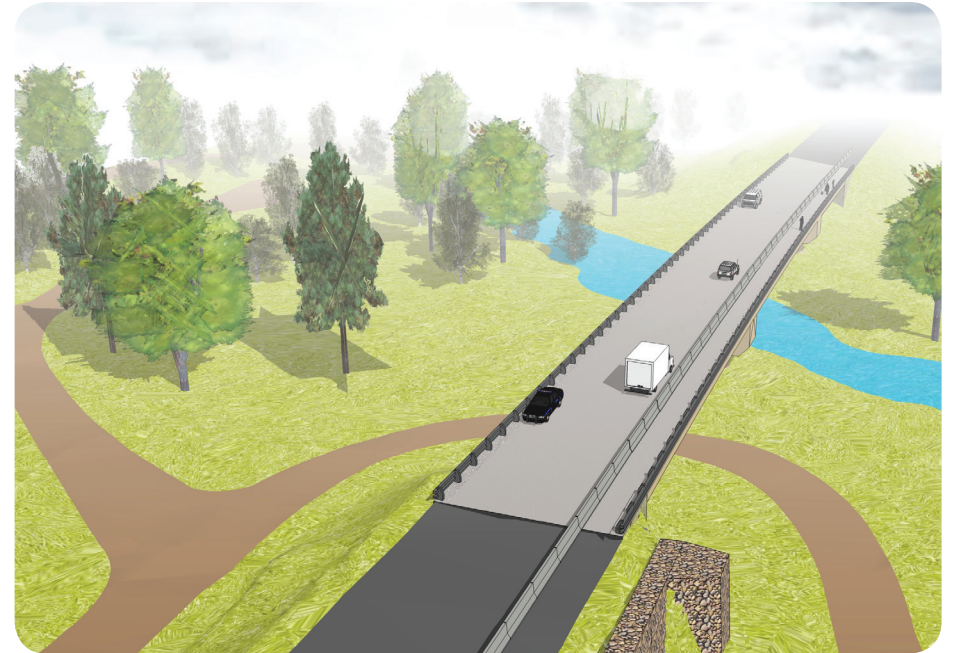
Bird's-eye view of existing bridge reduced to two vehicle lanes. The addition of a concrete barrier creates a pedestrian lane.
